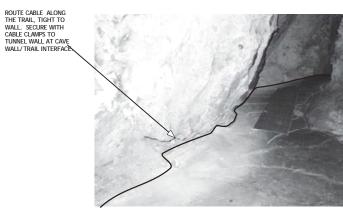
ROUTE OF CABLING INTO THE TUNNEL
